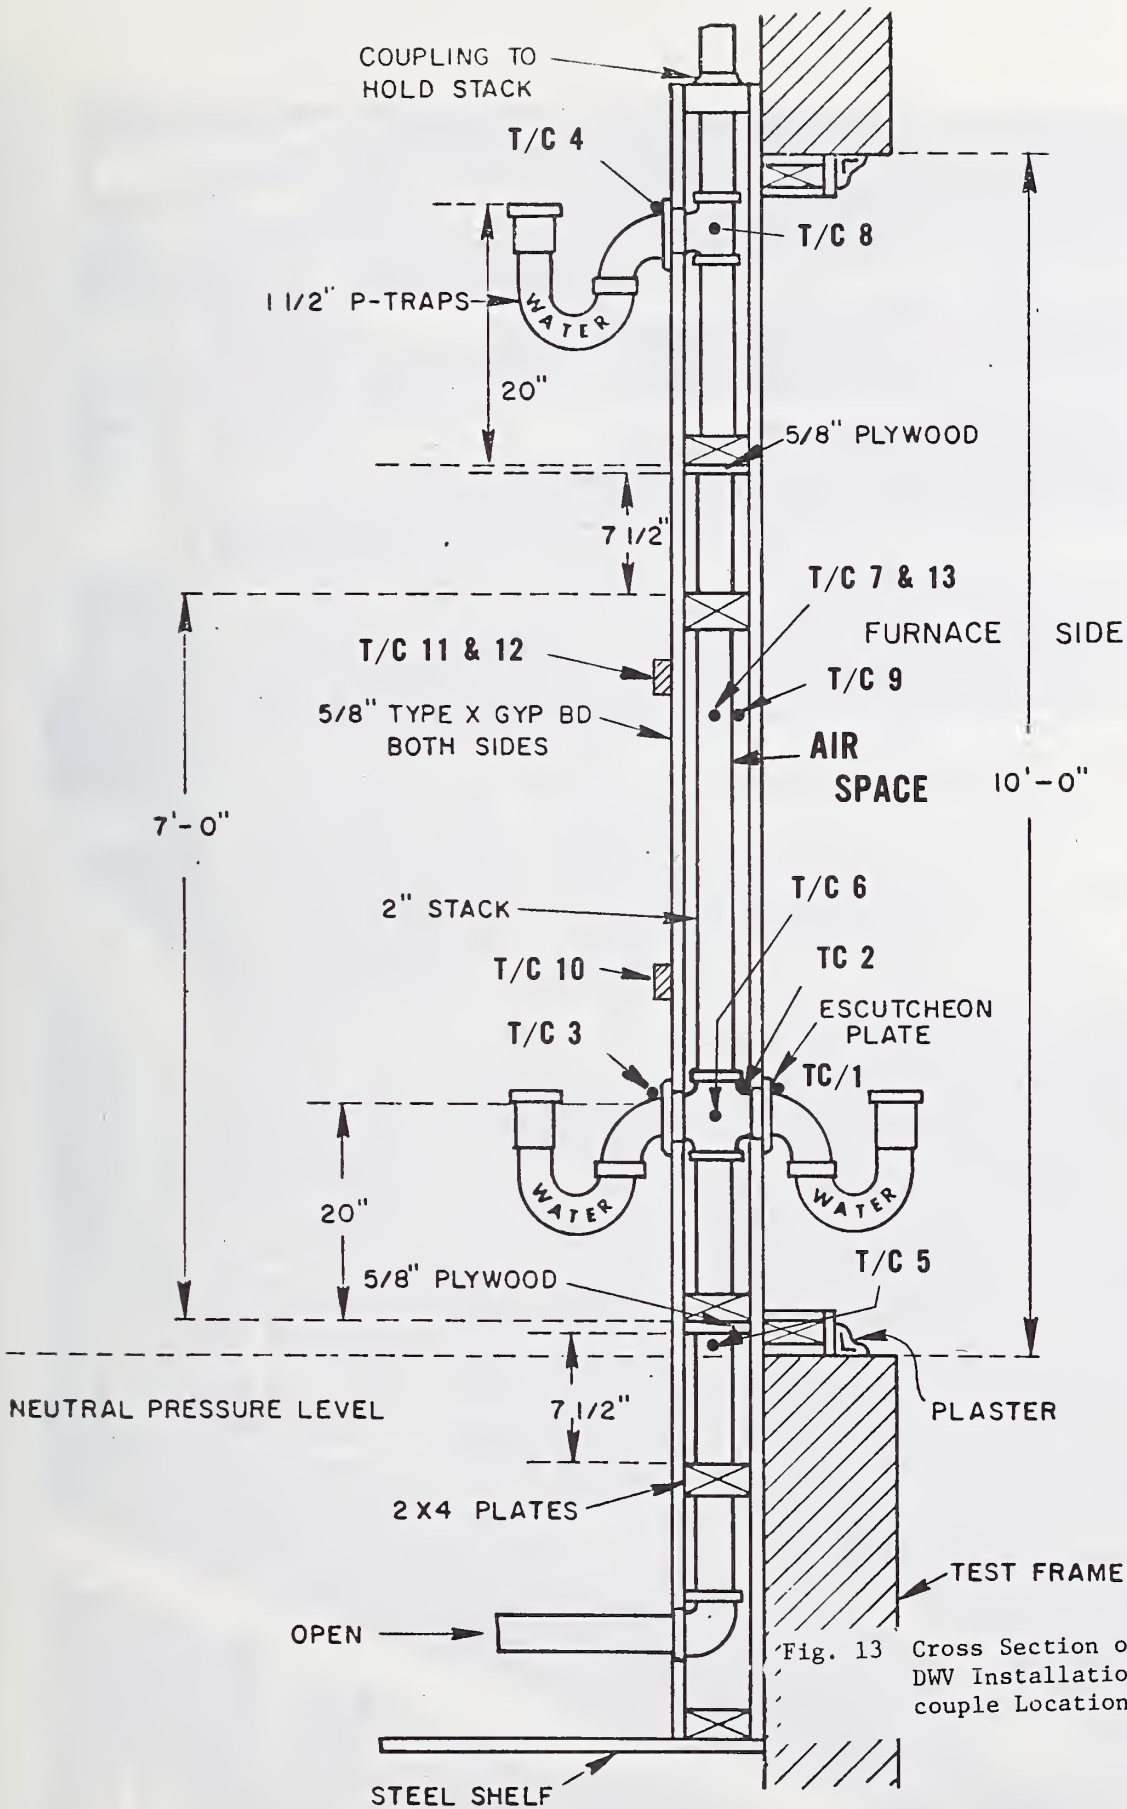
Cross Section of Wall Showing DWV Installation and Thermocouple Locations on Test 3.
